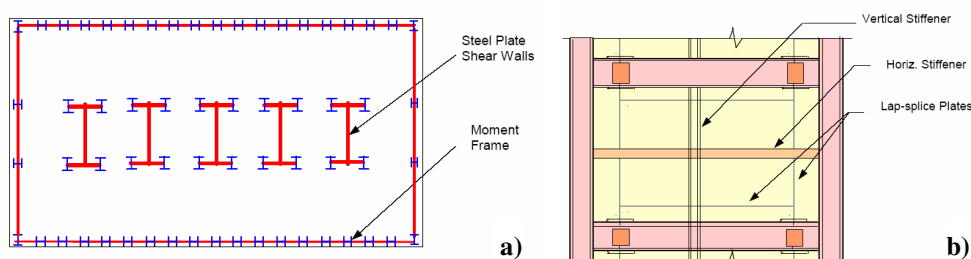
The Nippon Steel Building: typical floor plan (a) and details of steel shear walls (b)
